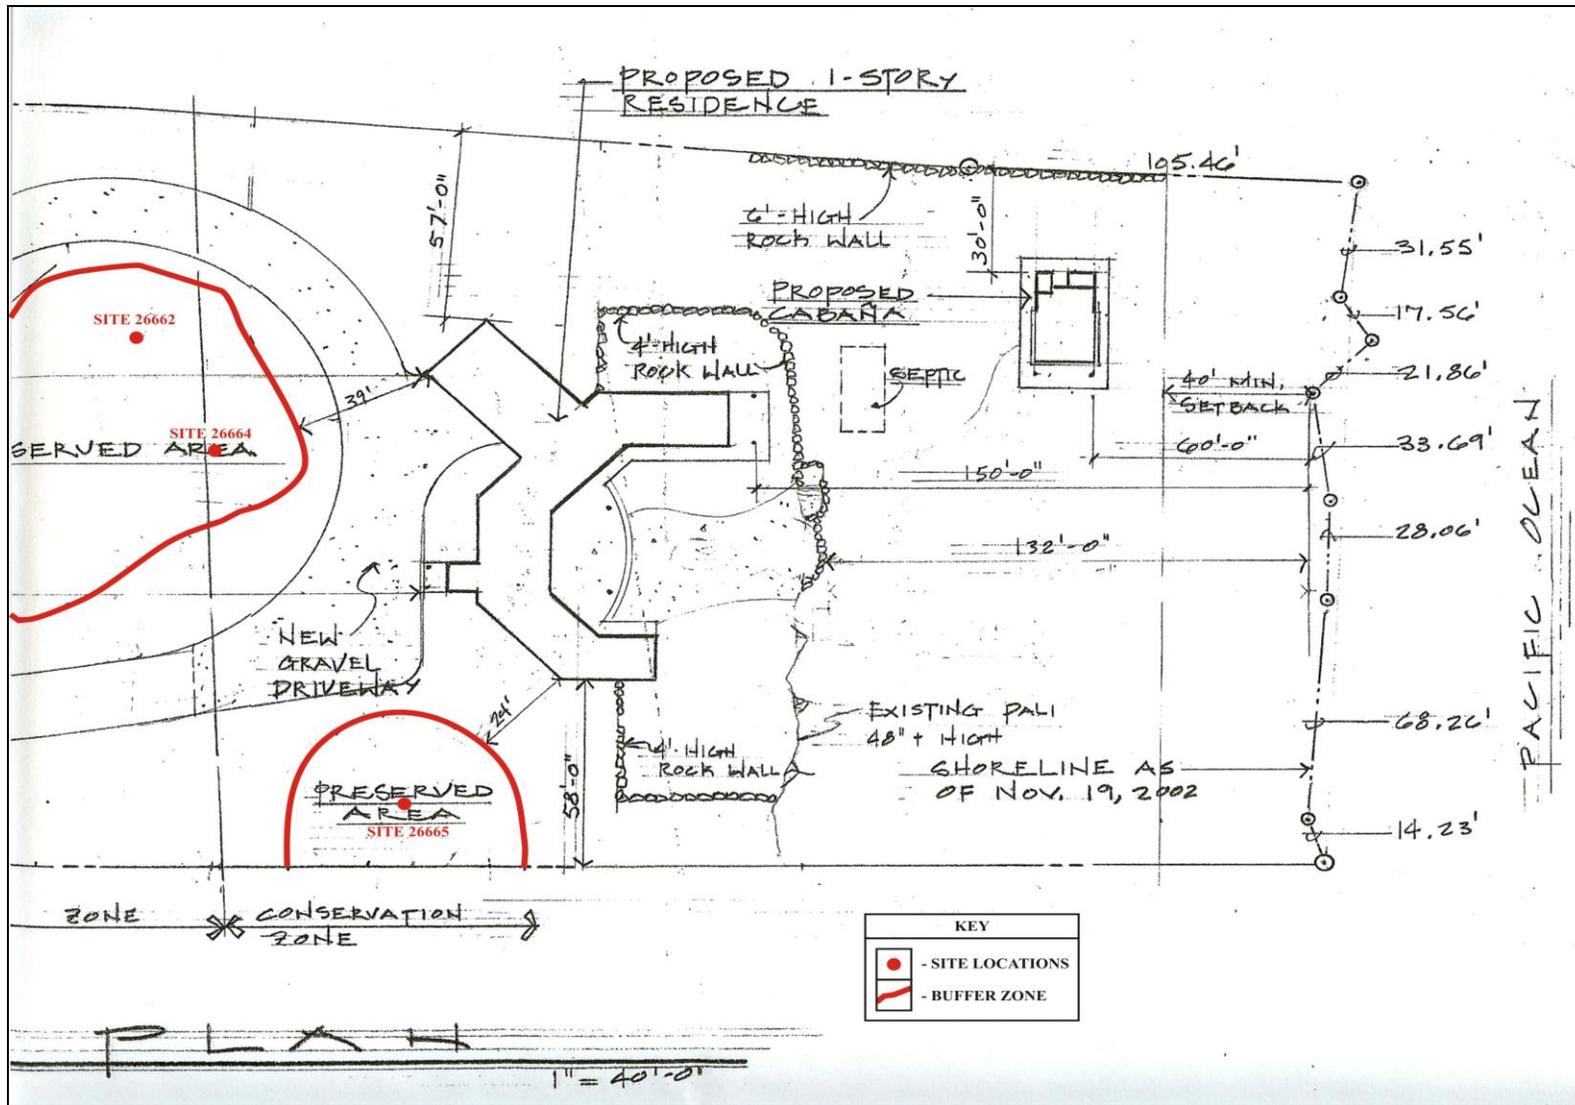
Schematic Plan View Map Showing Locations and Permanent Buffer Zones of Sites 50-10-45-26662, Site 50-10-45-26664, and Site 50-10-45-26665 in relationship to the location of the proposed dwelling (adapted from Clark *et al.* 2008).
